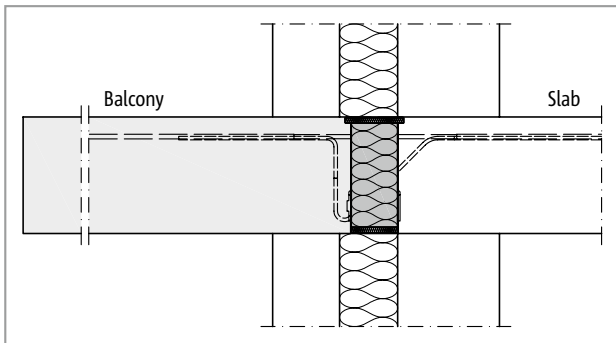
Schöck Isokorb® T type Z, K: Indirect support, non-load-bearing cavity masonry
